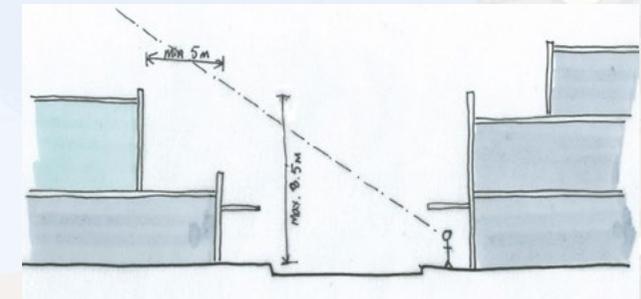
Building height and upper level setback for single storey 'contributory' and 'significant' heritage buildings
